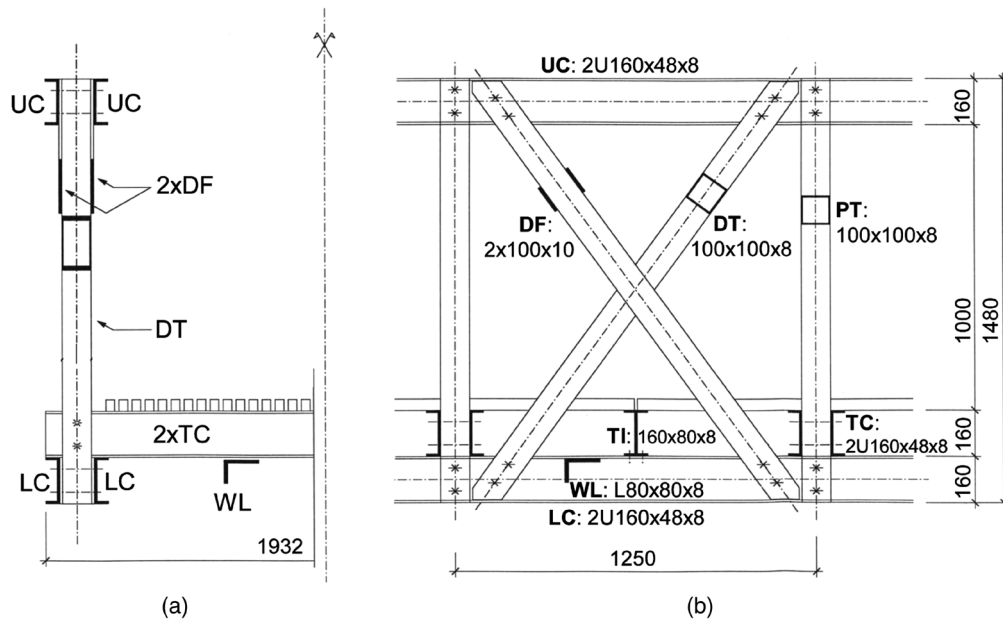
Technical drawings with detailing of the Pontresina bridge. [Keller et al., 2015]
